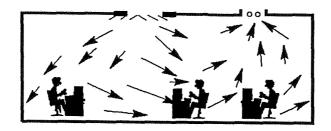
Mixing ventilation with air supply and extract through the ceiling
